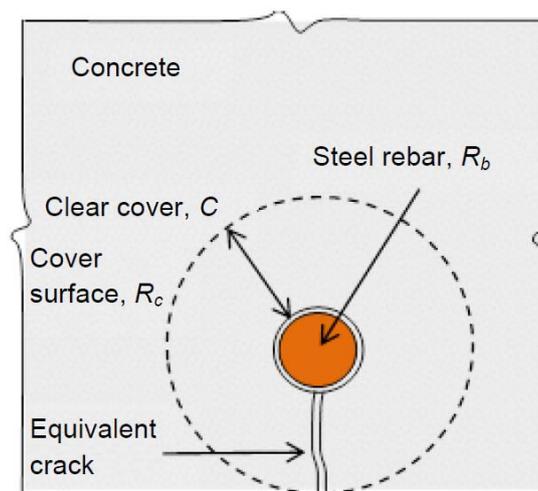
Idealization of cover concrete as thick-walled cylinder model for predicting concrete crack development and bond strength evolution
